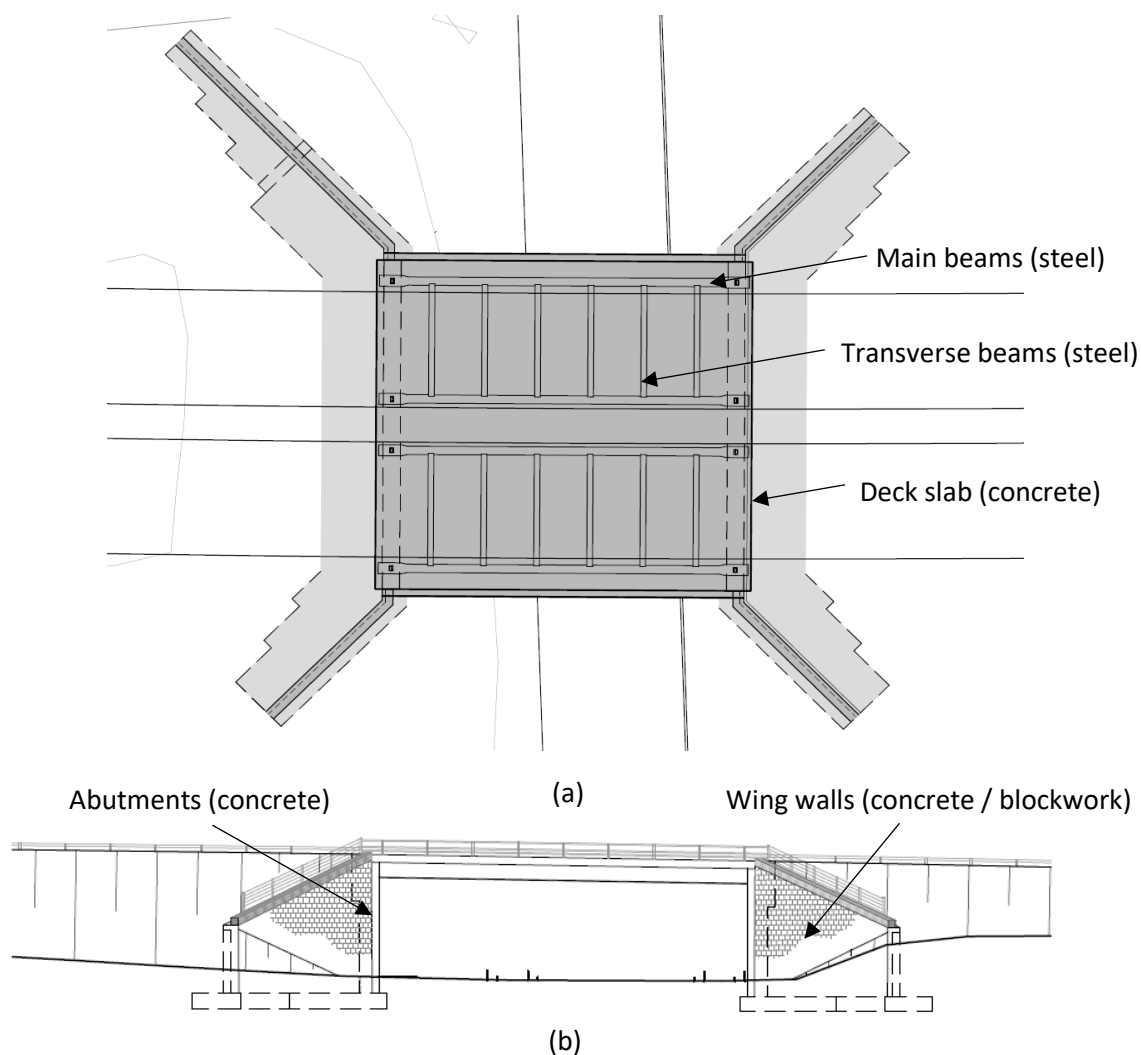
(a) plan and (b) front elevation design drawings of case study structure.
